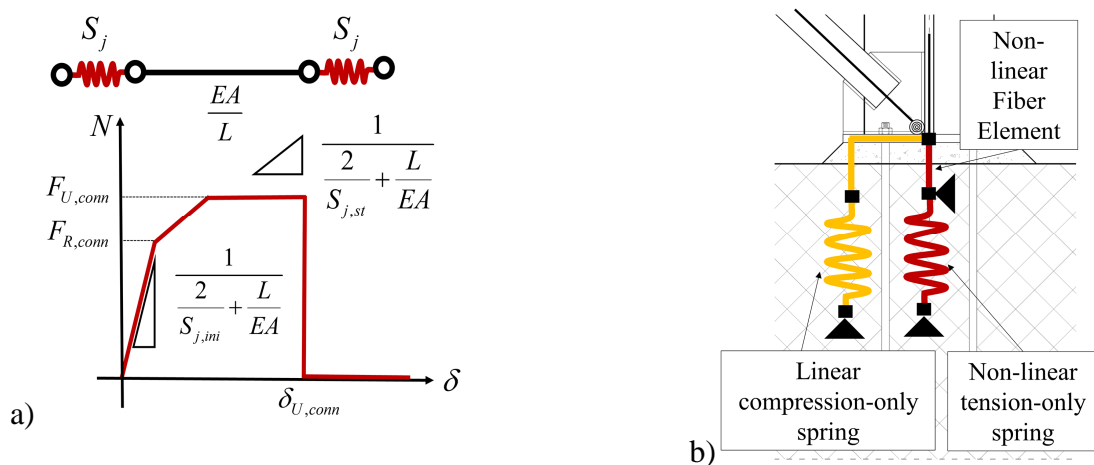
Connection modelling for the PCB case: (a) truss-to-column connections; (b) column base connections.
